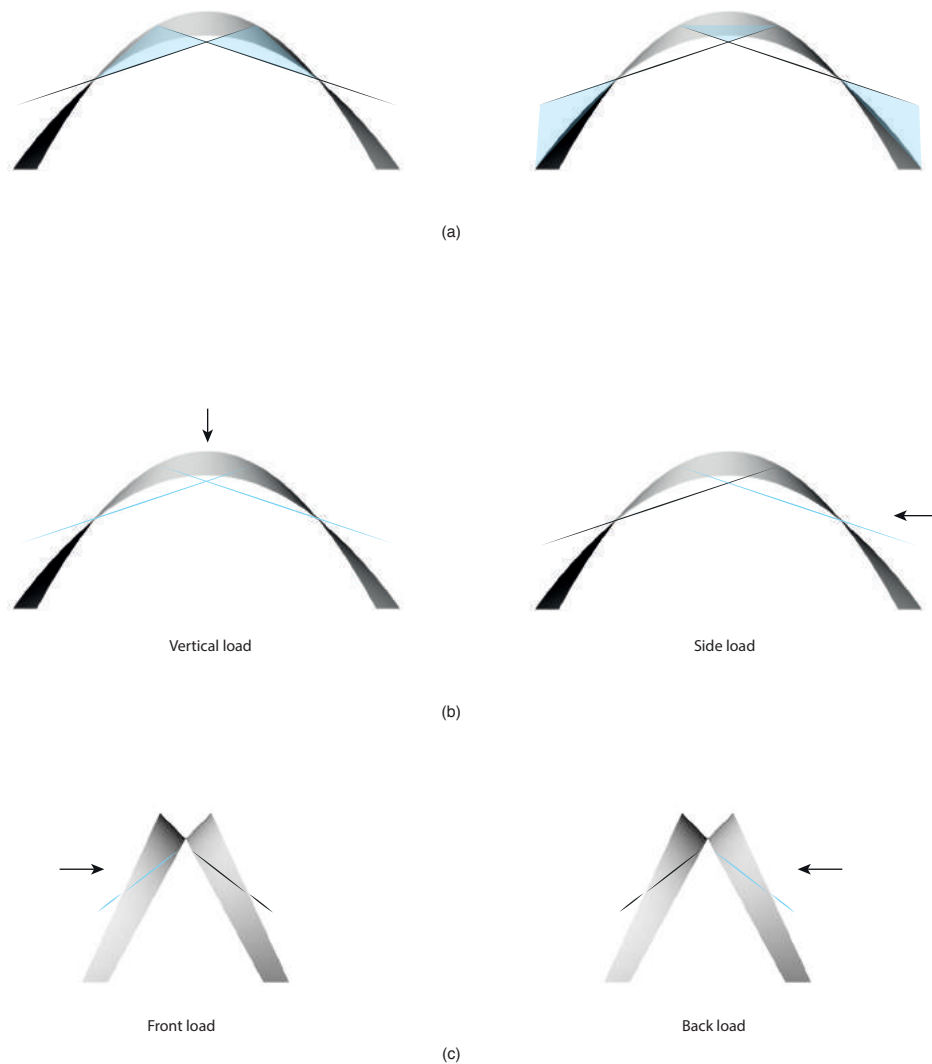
Tension cable arch. (a) Triangle connection arch, (b) Cable activation side and top load, (c) cable activation back and front load.
